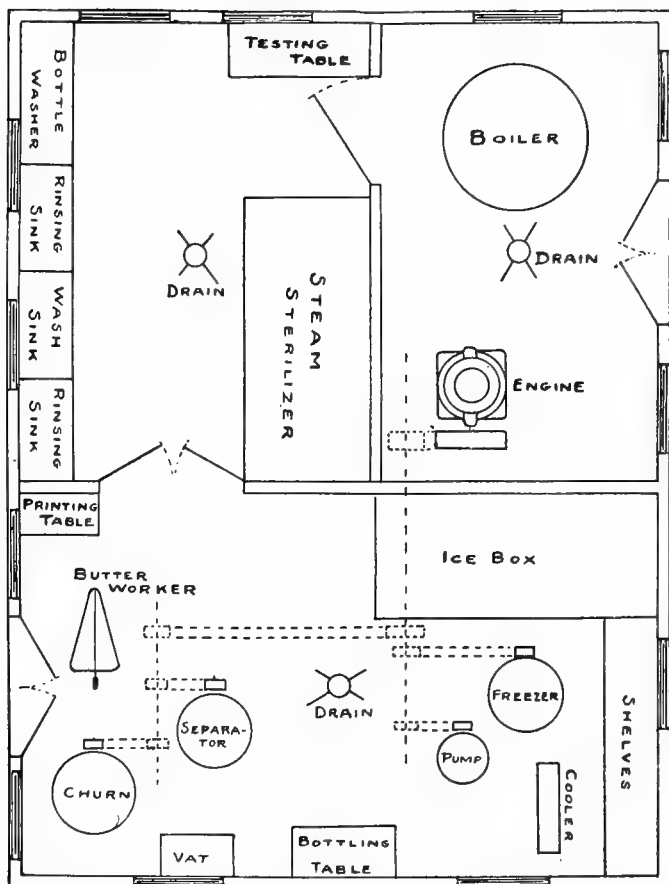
Floor Plan of Dairy House for Retail Milk Trade, Suitable for Fifty Cows. 18'x24'.
